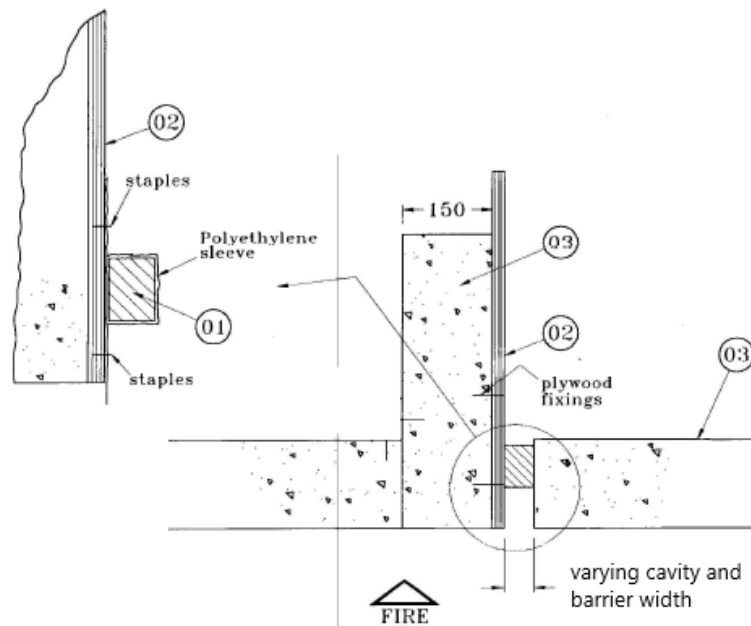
example cross-sectional detail showing the installation of the cavity barrier between masonry leaf and a masonry leaf with timber facing. See key below.
